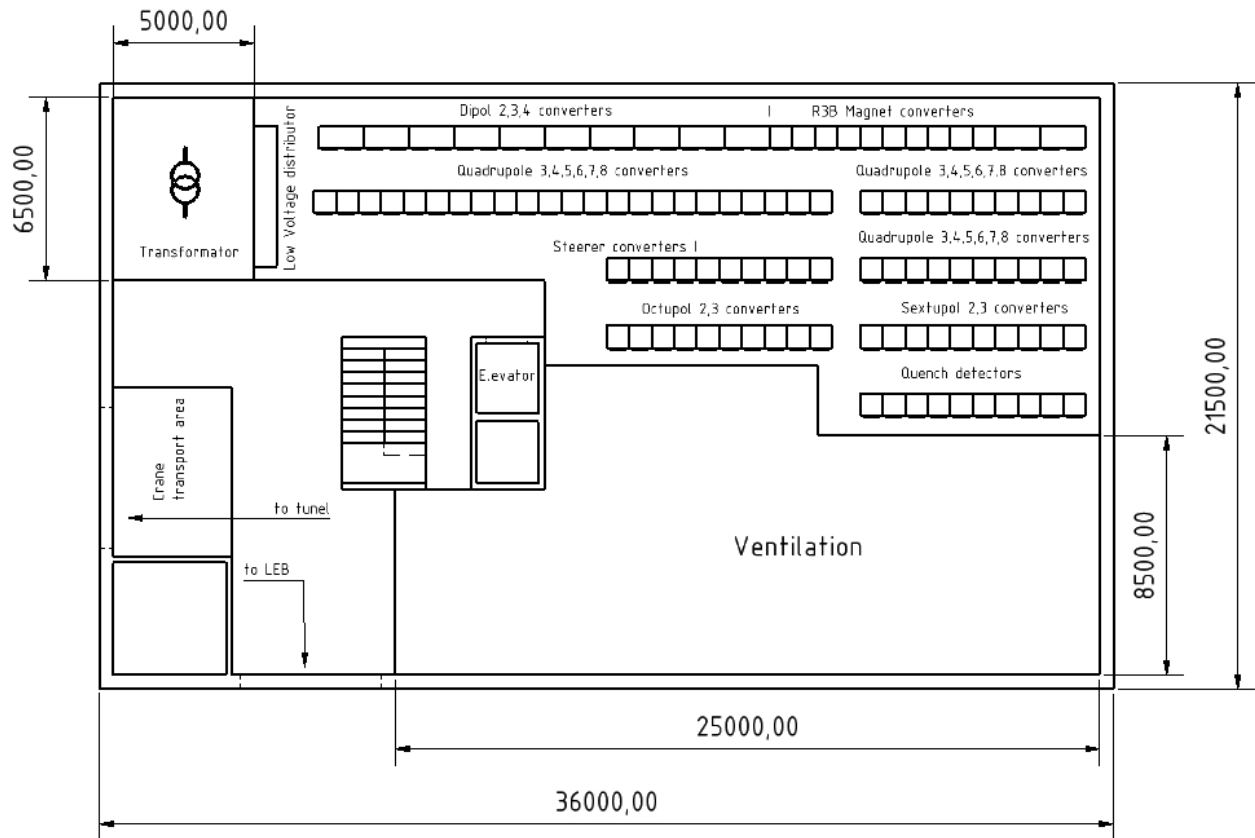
Planned arrangement of power supplies in Service-Building (building #6a), Level 0.
